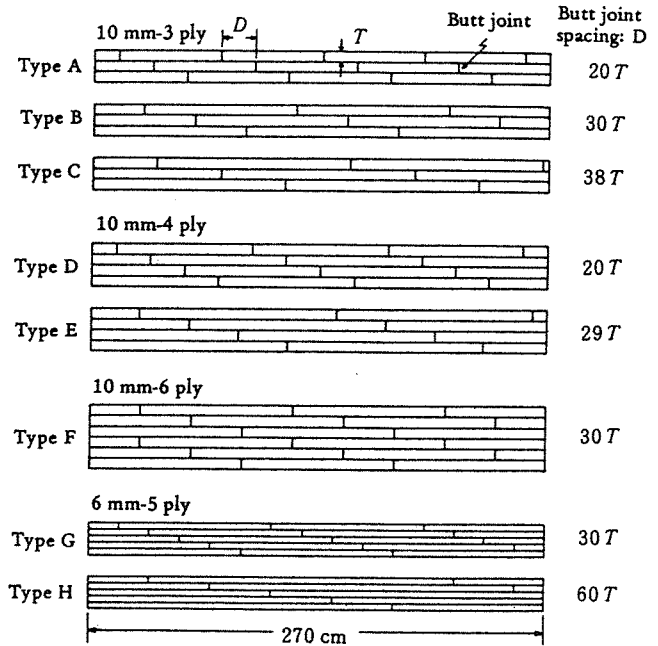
Construction layouts of laminated-veneer lumber (LVL) used as flange materials of I beams and box beams.
